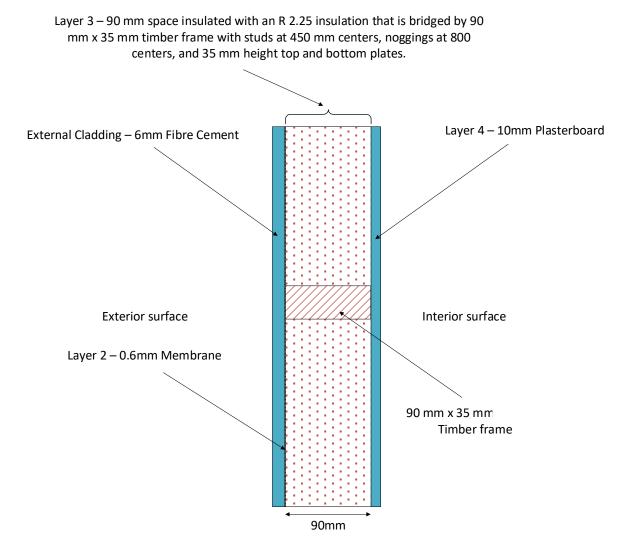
LWDF TIMBER FRAME WALL BUILD UP
